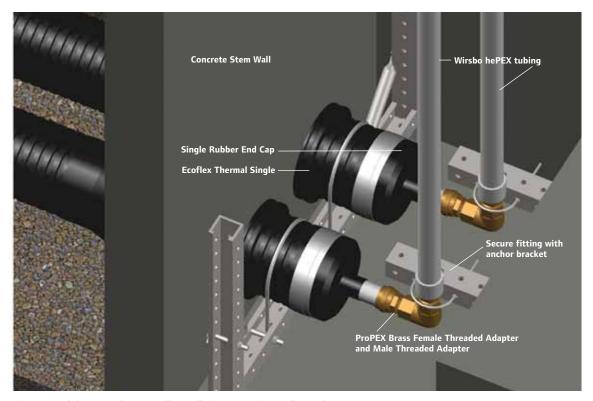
Slab-on-grade Dry Well Installation – Interior Wall Attachment
